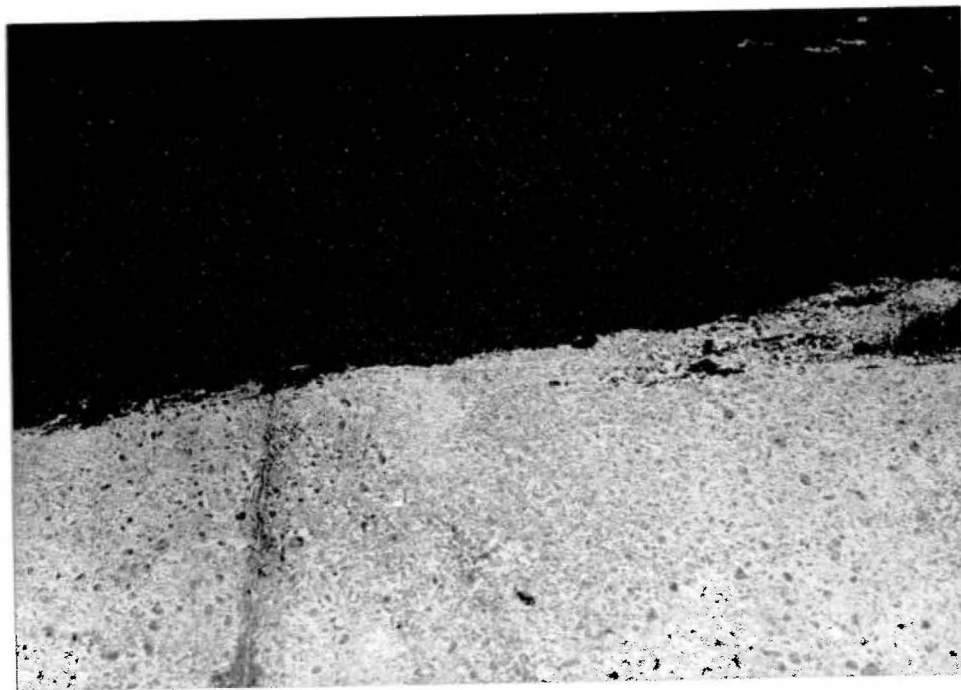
Fiber-asphalt Sami layer placed over cracked pavement.
